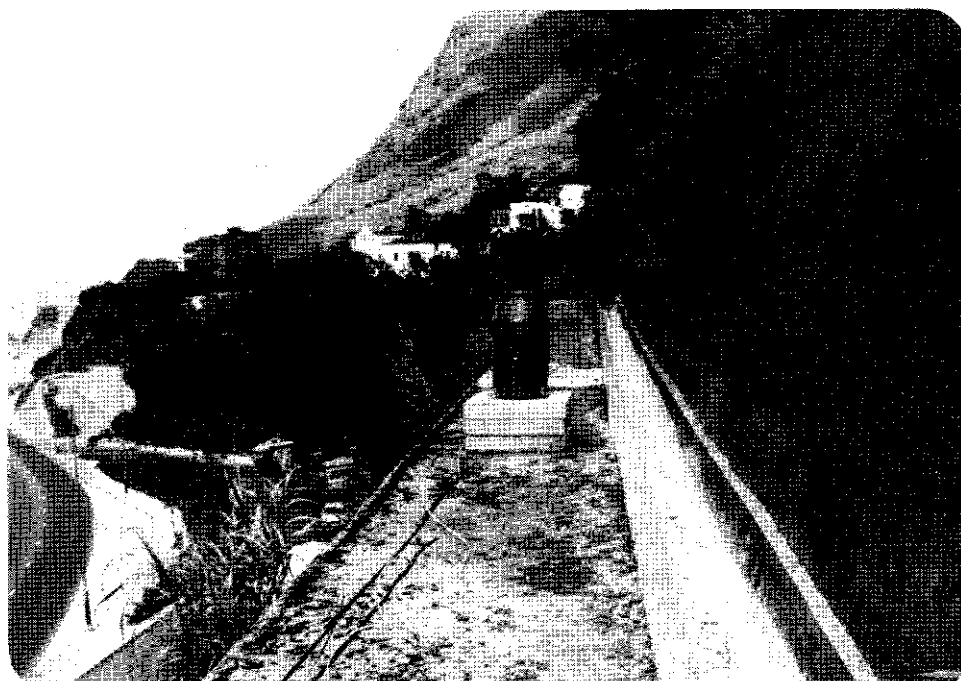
Raingauge location on chunam slope (see figure 4.6)
